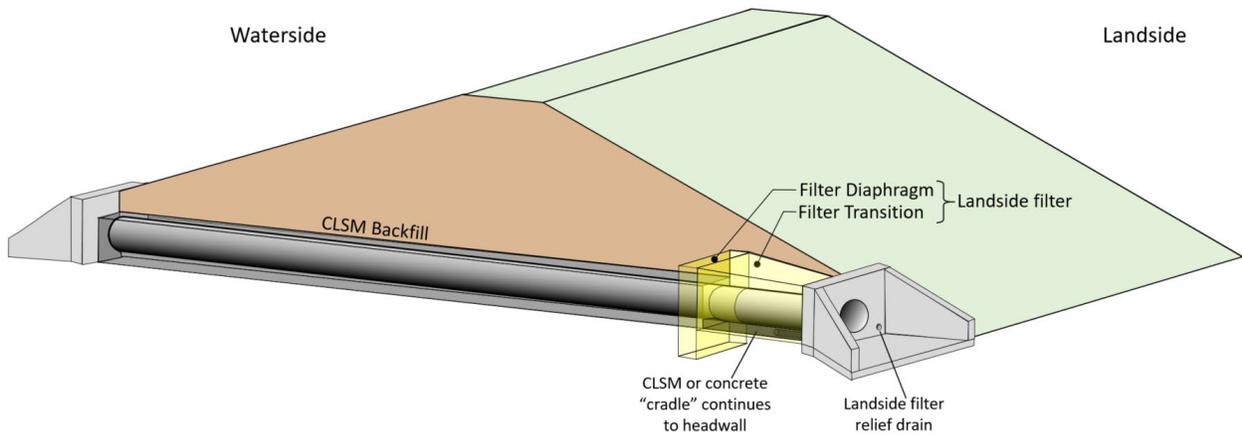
View of a gravity pipe through an embankment with an internal seepage filter.
